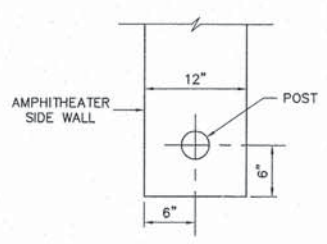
DETAIL: PIPE HANDRAIL (NEXT TO SEATING)
